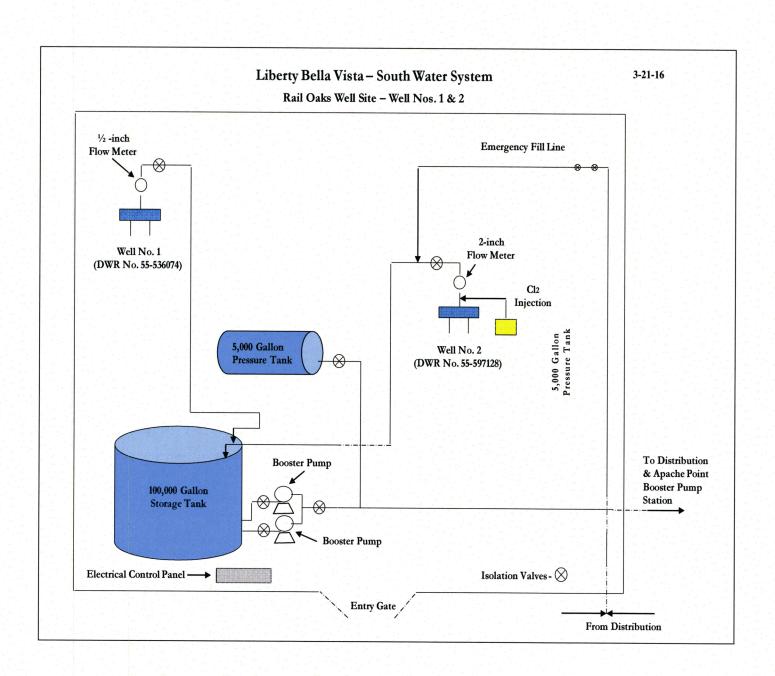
SOUTH WATER SYSTEM RAIL OAKS WELL SITE - WELL NOS. 1 & 2
